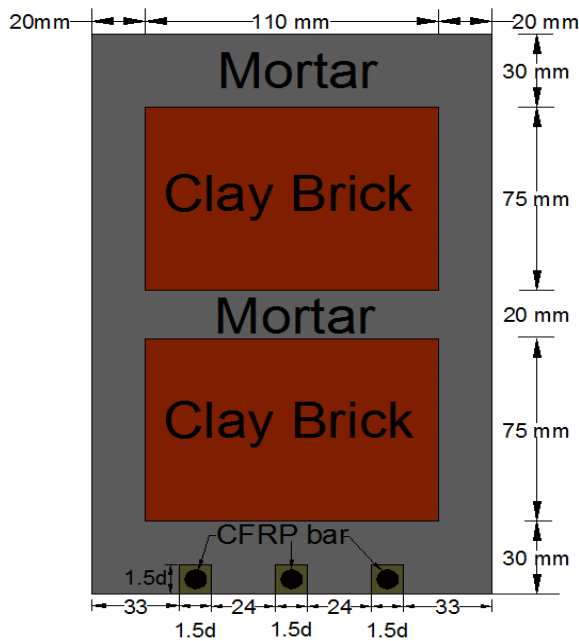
(a) Cross-section of NSM strengthened masonry beam with cement mortar as bed joint
